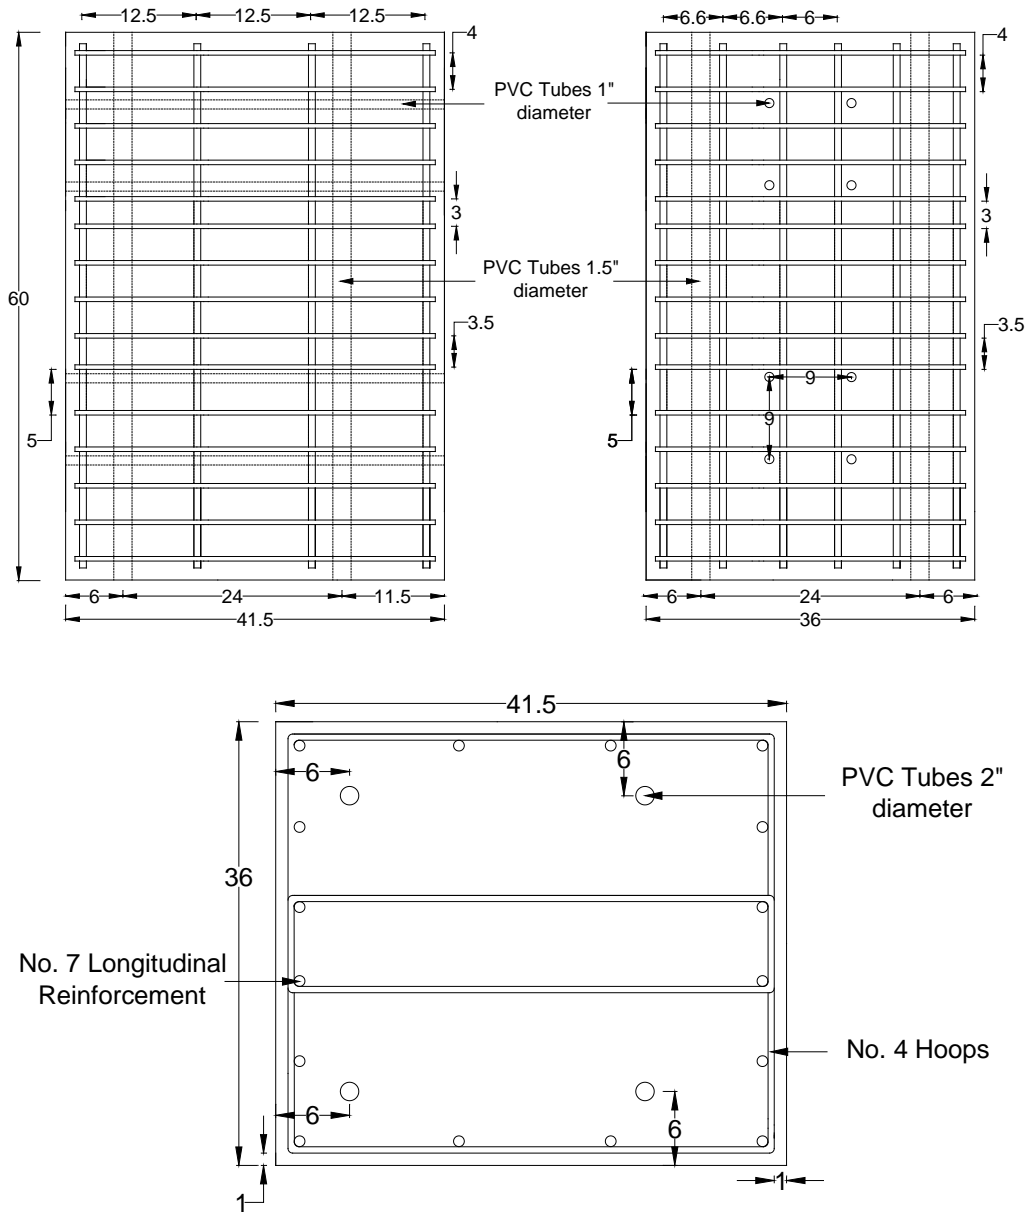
Big block reinforcement detailing for CB-4 (all dimensions in inches)
